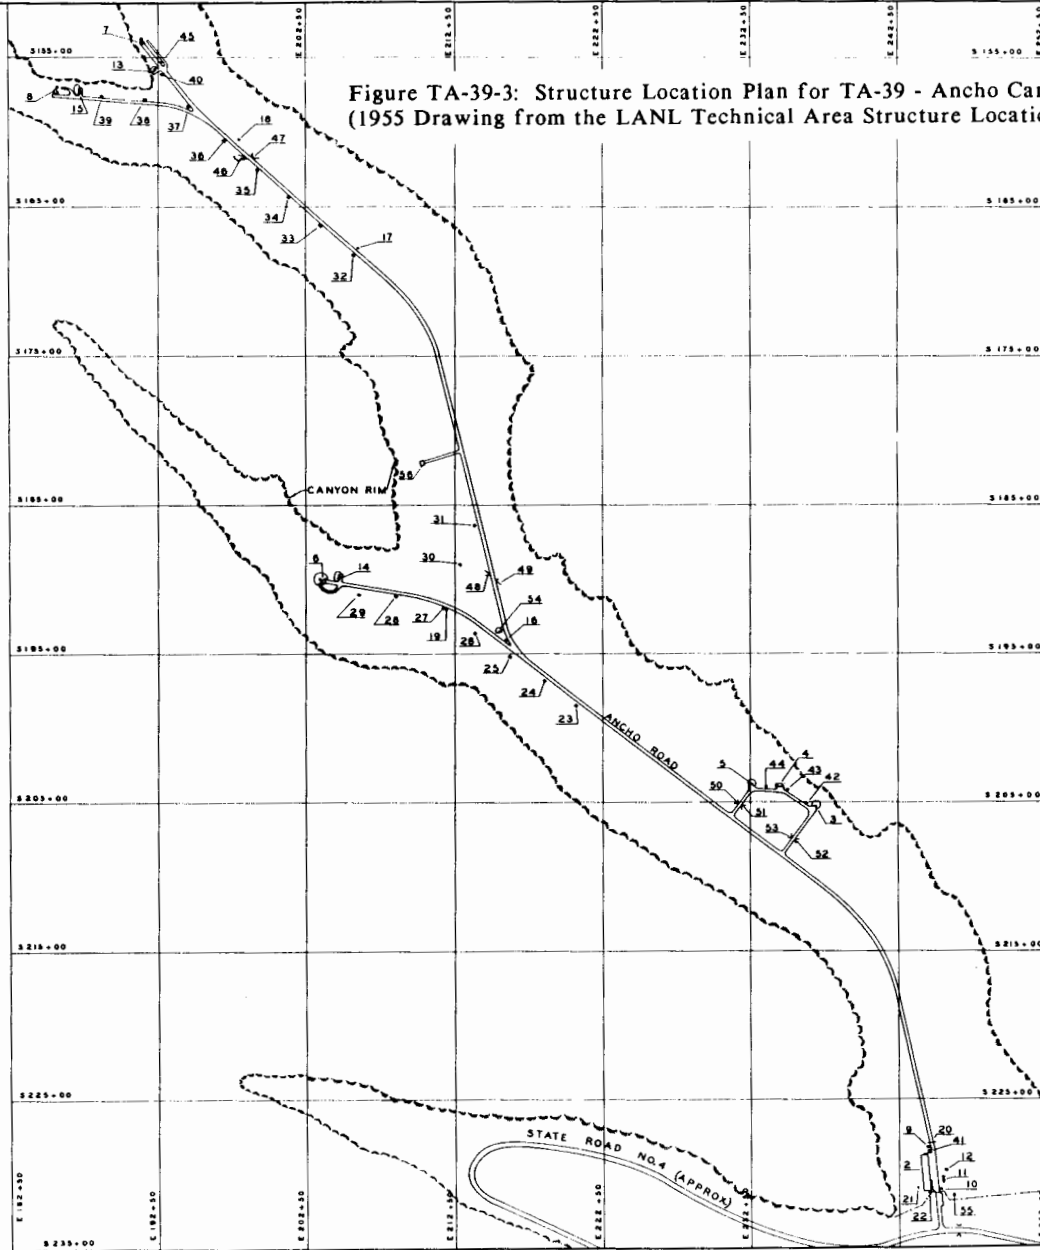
Structure Location Plan for TA-39 - Ancho Canyon Site (1955 Drawing from the LANL Technical Area Structure Location Plans)
